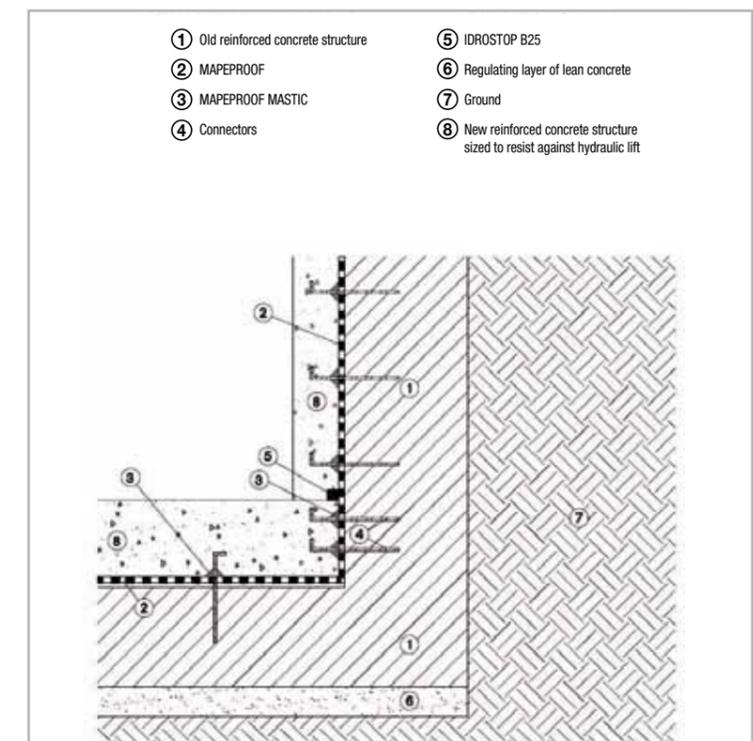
Detailed layout of relining the inside of a room by applying Mapeproof on the horizontal and vertical surfaces and then casting the reinforced concrete floor slab and retaining walls
